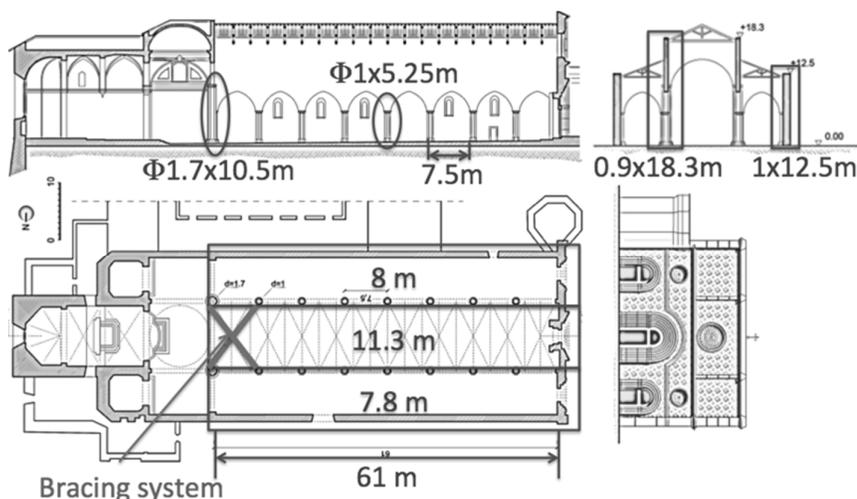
Sections of the Basilica of Santa Maria di Collemaggio.
